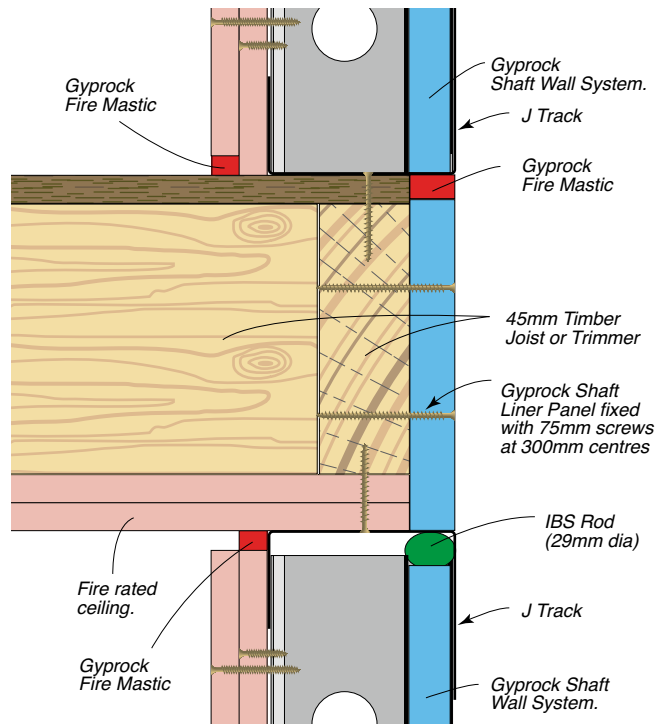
Junction of - /120/120 Shaftwall System to Timber Floor (Where timber framing is permitted)
